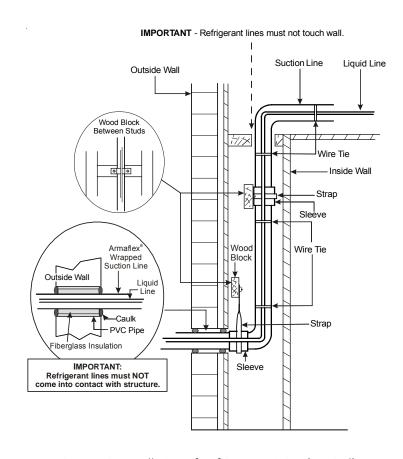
Installation of Refrigerant Piping (Vertical)
